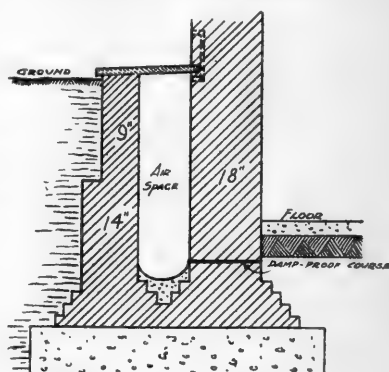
Section through a wall adjoining high ground with a dry area covered and ventilated.
